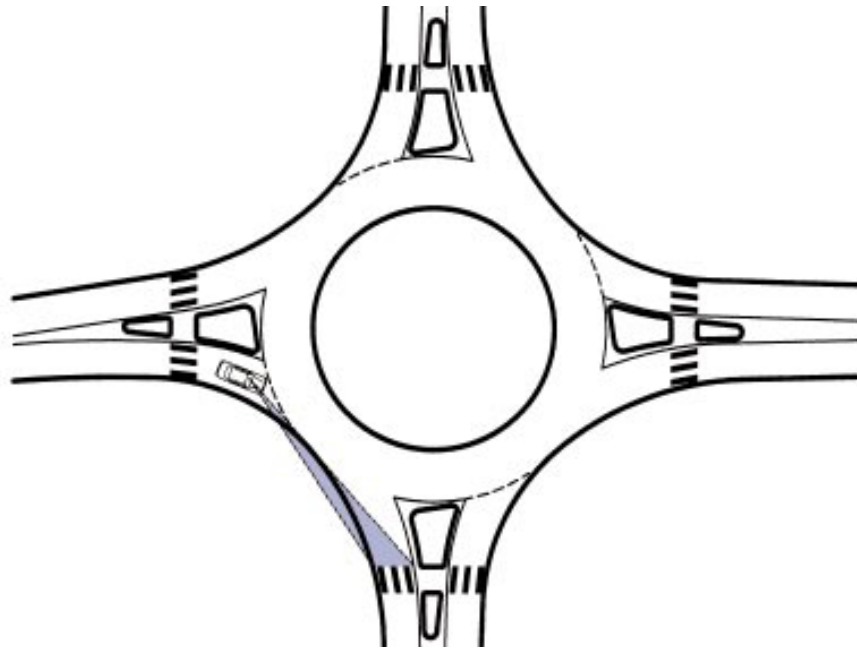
Sight Distance to Crosswalk on Immediate Downstream Exit (Source: FHWA Roundabouts: An Informational Guide)
